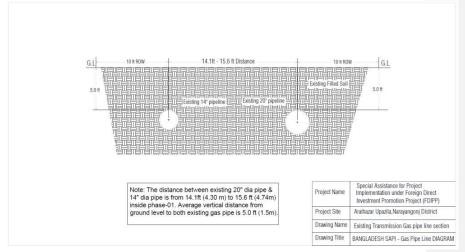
Typical Cross Section of Existing Gas Transmission Pipelines
